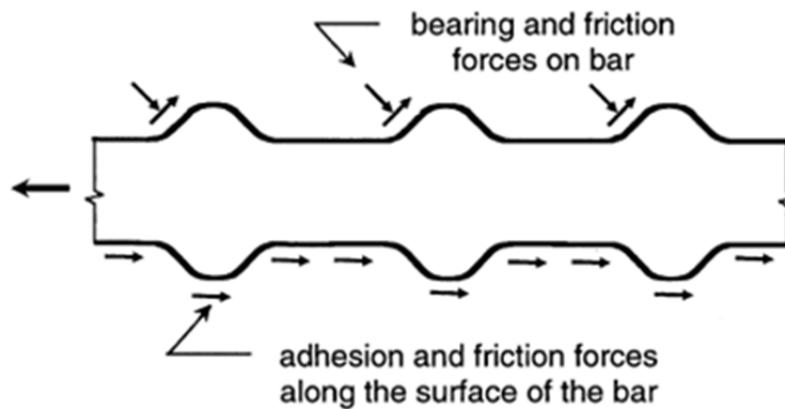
Bond forces acting on steel embedded in concrete (ACI 408 2003)
